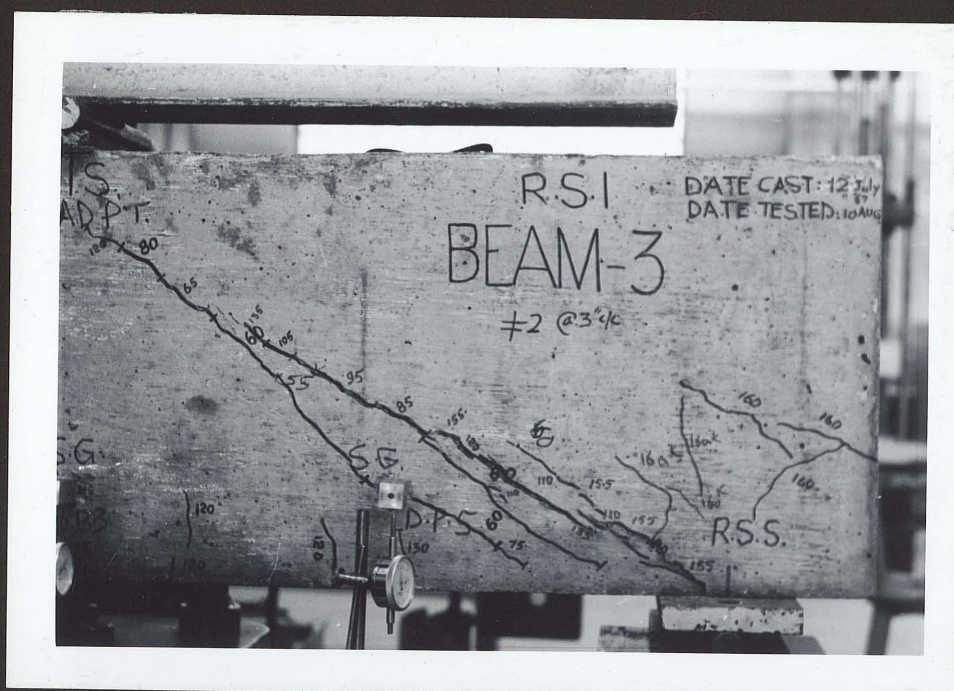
Beam 3: Detail and Crack Pattern (side R.S.1)
